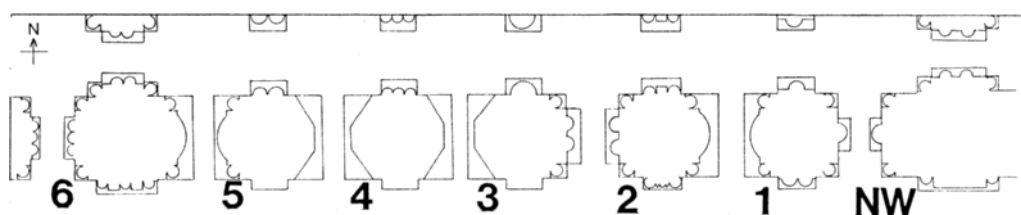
Castle Acre Priory: schematic reconstruction of the nave pier system, north arcade
